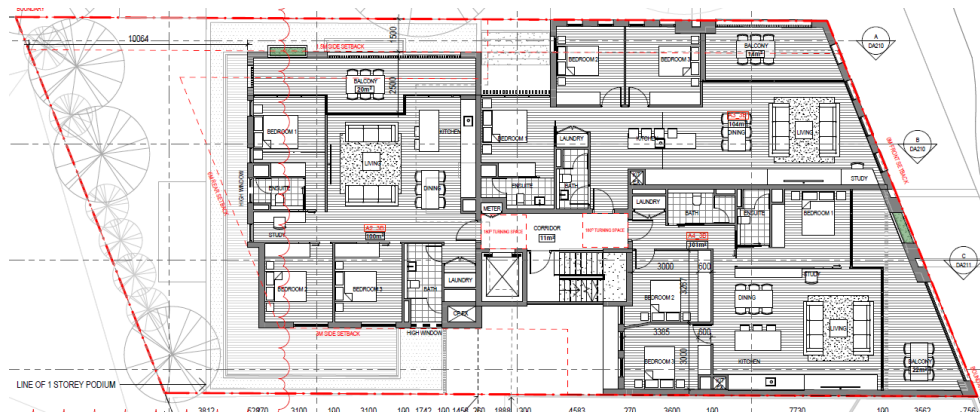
Proposed level 2 floor plan - 18-20A Perouse Road, Randwick (Source: Curzon & Partners)
